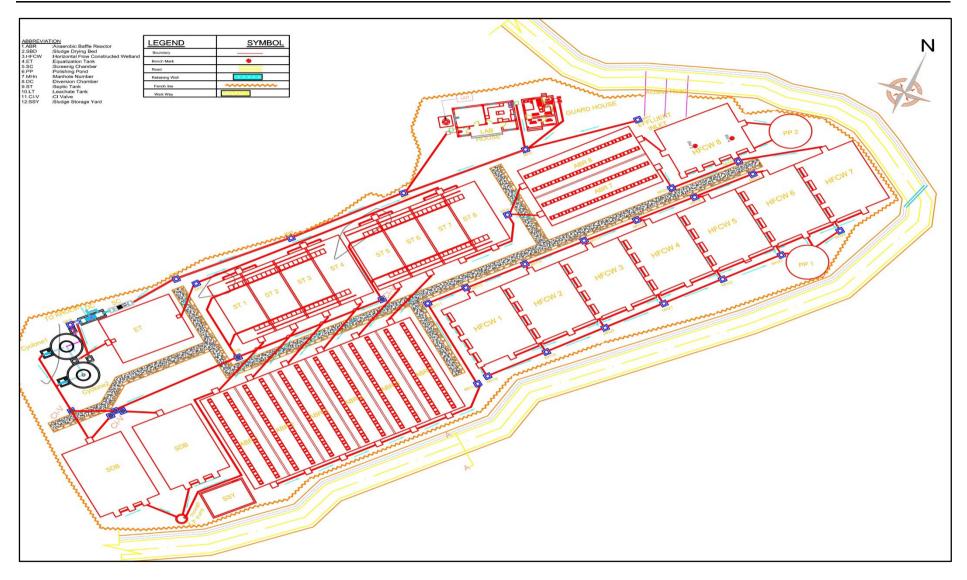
Figure IV-VI: Layout plan of the Proposed Jilu WWTP
